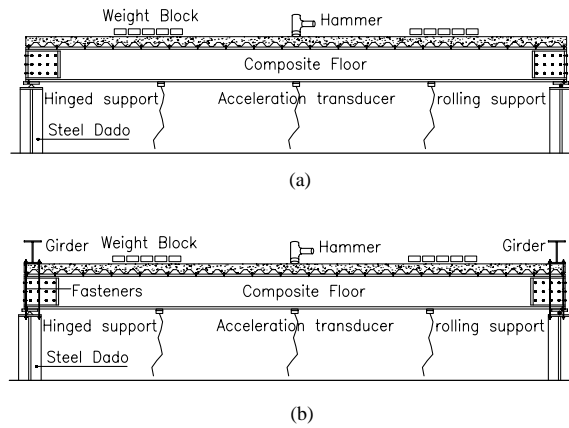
Test Set-up: (a) Simply Supported Slab; (b) Fix Supported Slab
